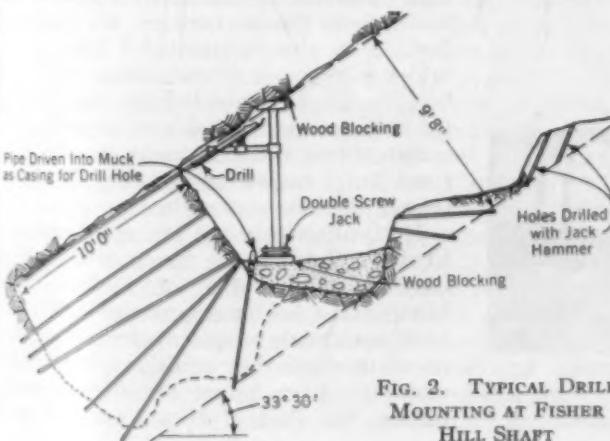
TYPICAL DRILL MOUNTING AT FISHER HILL SHAFT
